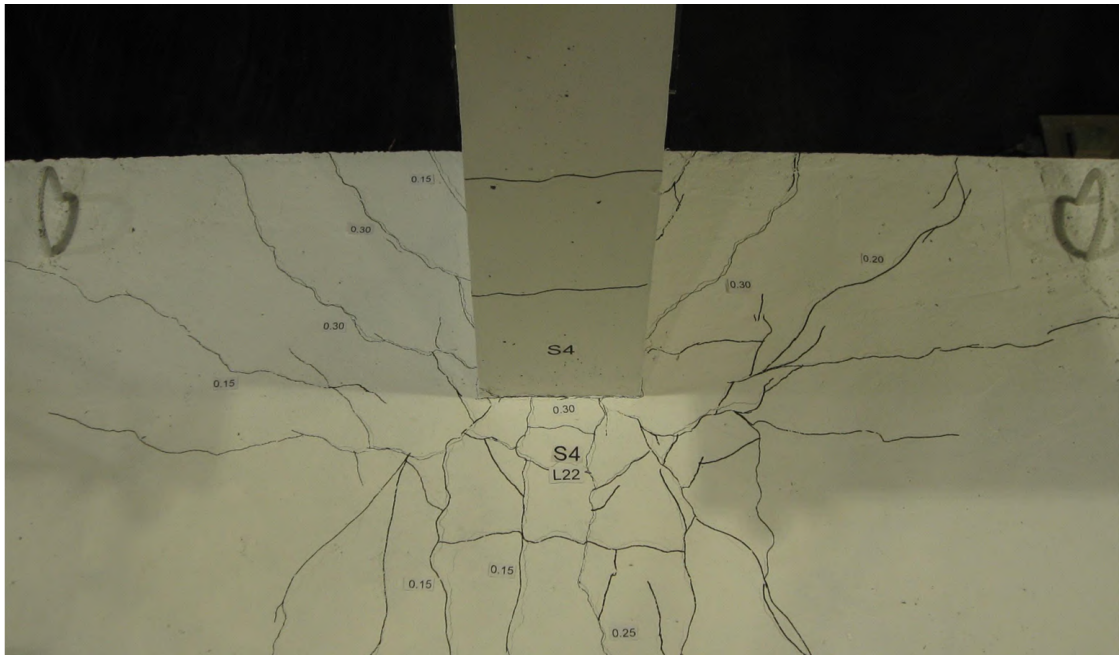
Specimen 4 slab cracks at $V = 246.0$ kN
